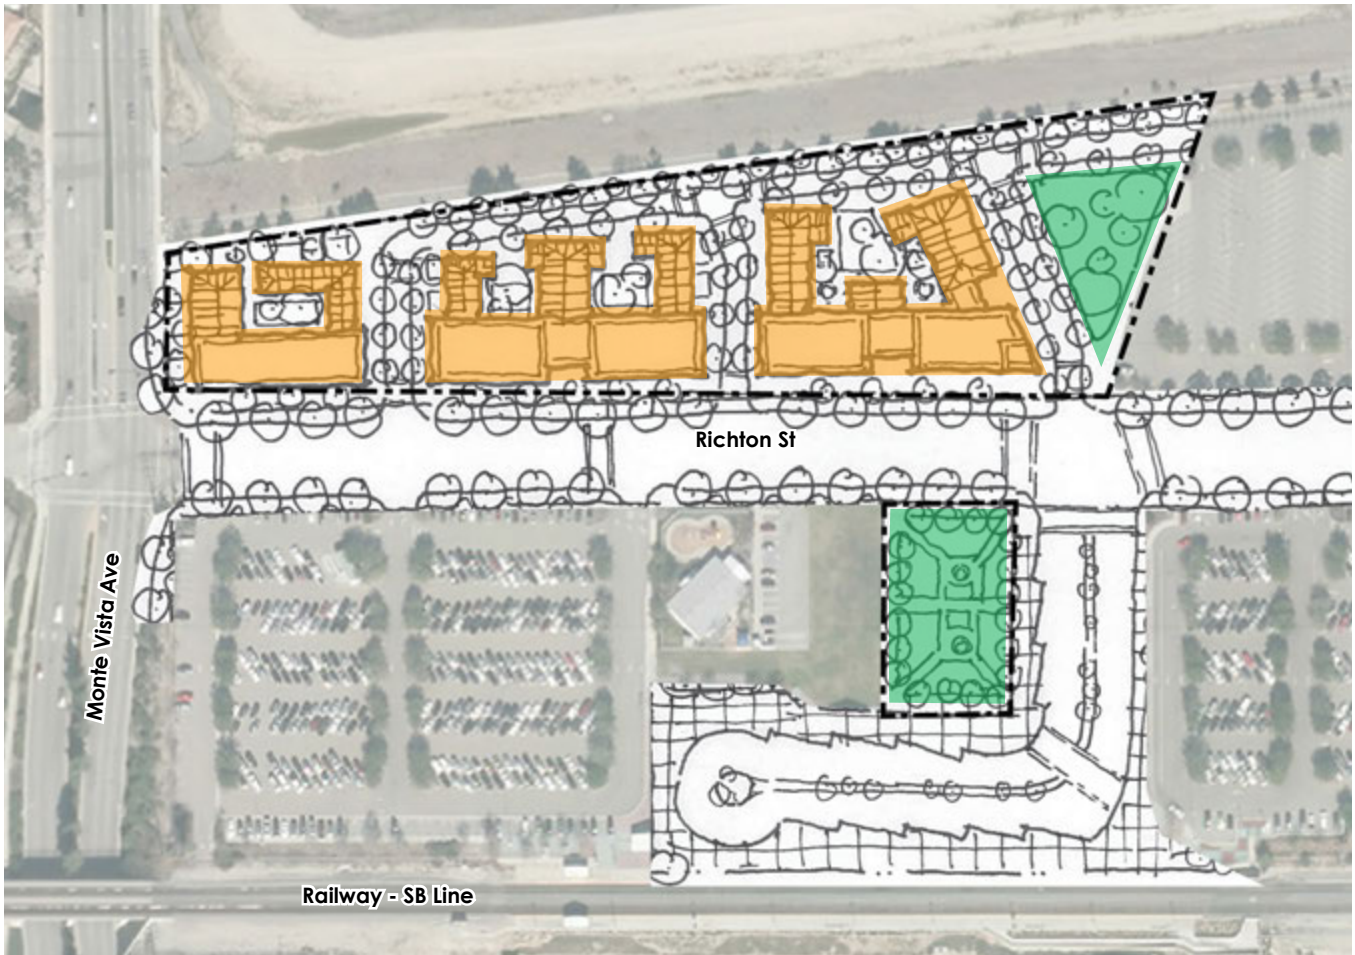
ILLUSTRATIVE SITE PLAN FOR CALTRANS PARKING LOTS ADJACENT TO THE PE TRAIL AND CITY/SANBAG LAND (ALTERNATIVE A-2)
